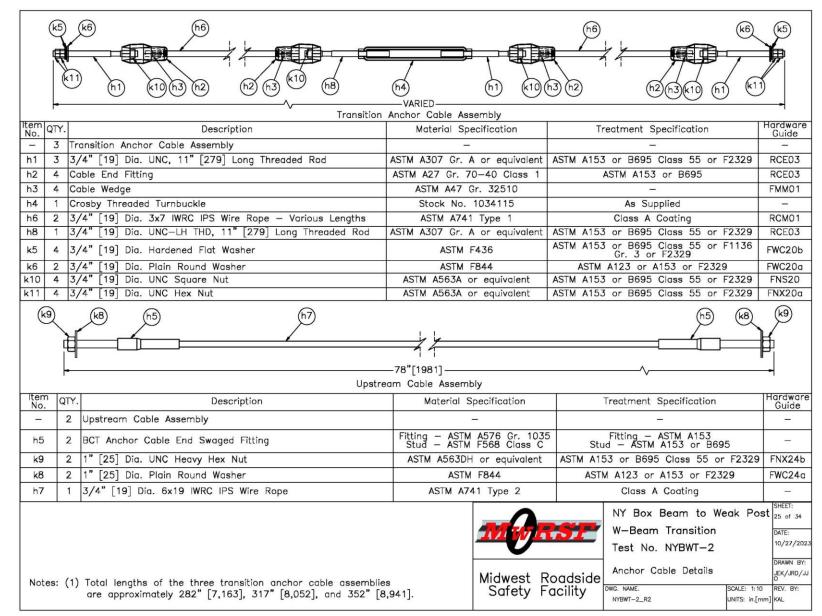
Anchor Cable Details, Test No. NYBWT-2
